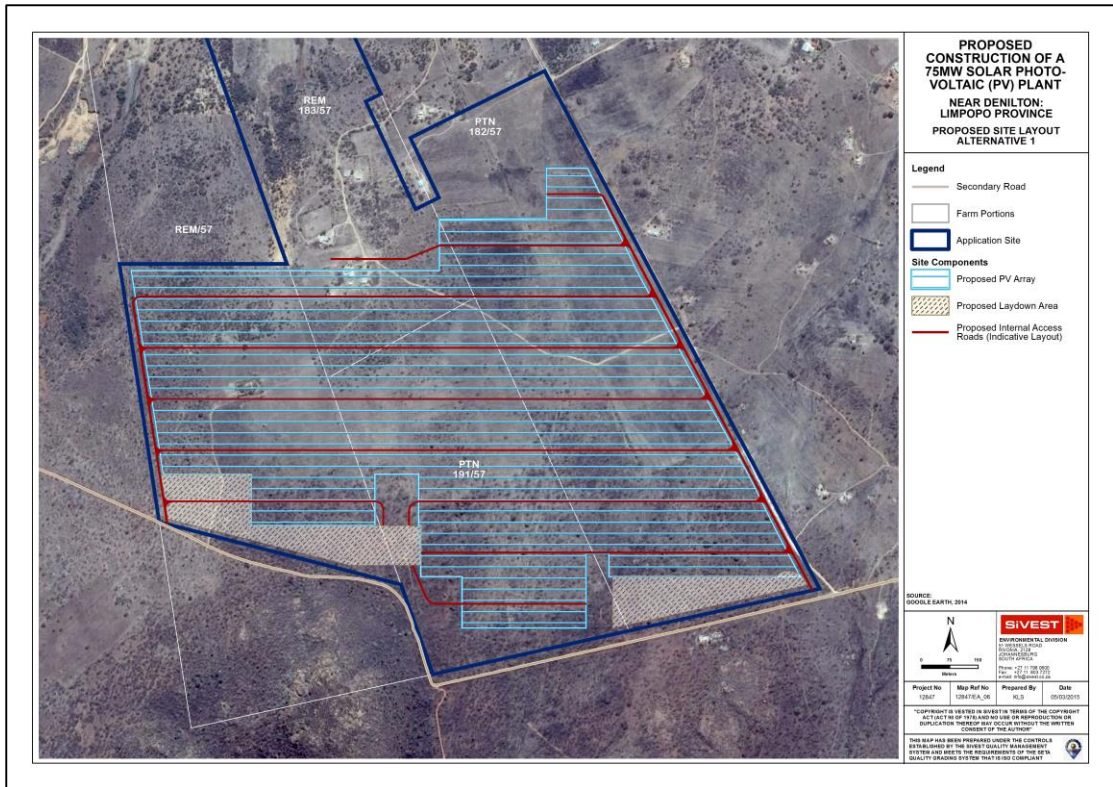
Nokukhanya – Proposed Alternative Layout 1
